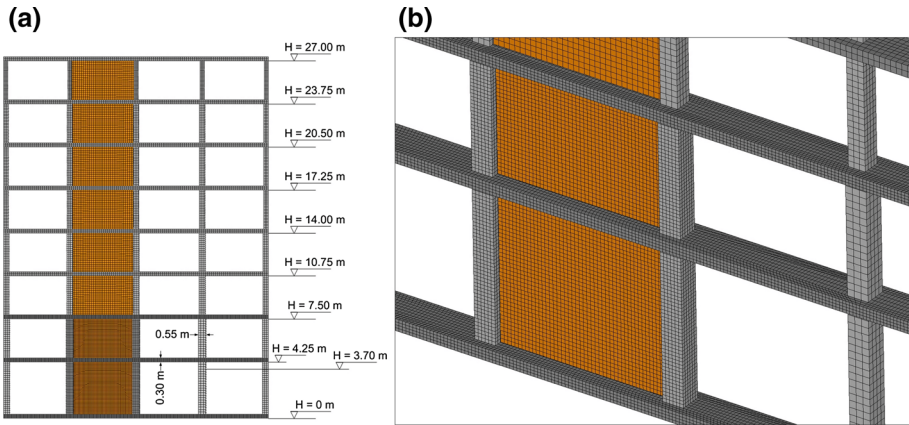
Views of the Finite Element Mesh of building 1. a Elevation, b close-up
